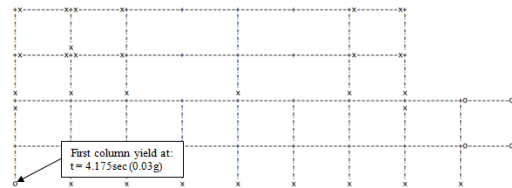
Damage state frame of first yielding point for Airport Labuan building.
